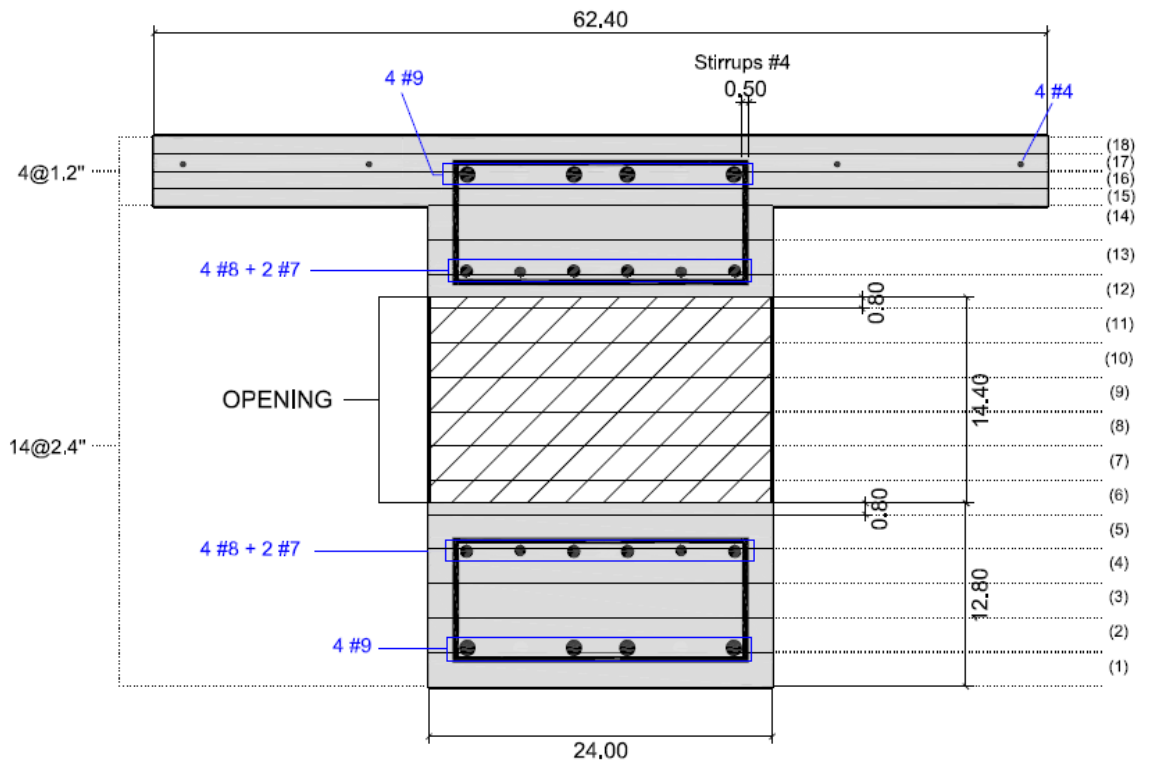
Cross section 3 for Specimen 1. Dimensions in inches.
